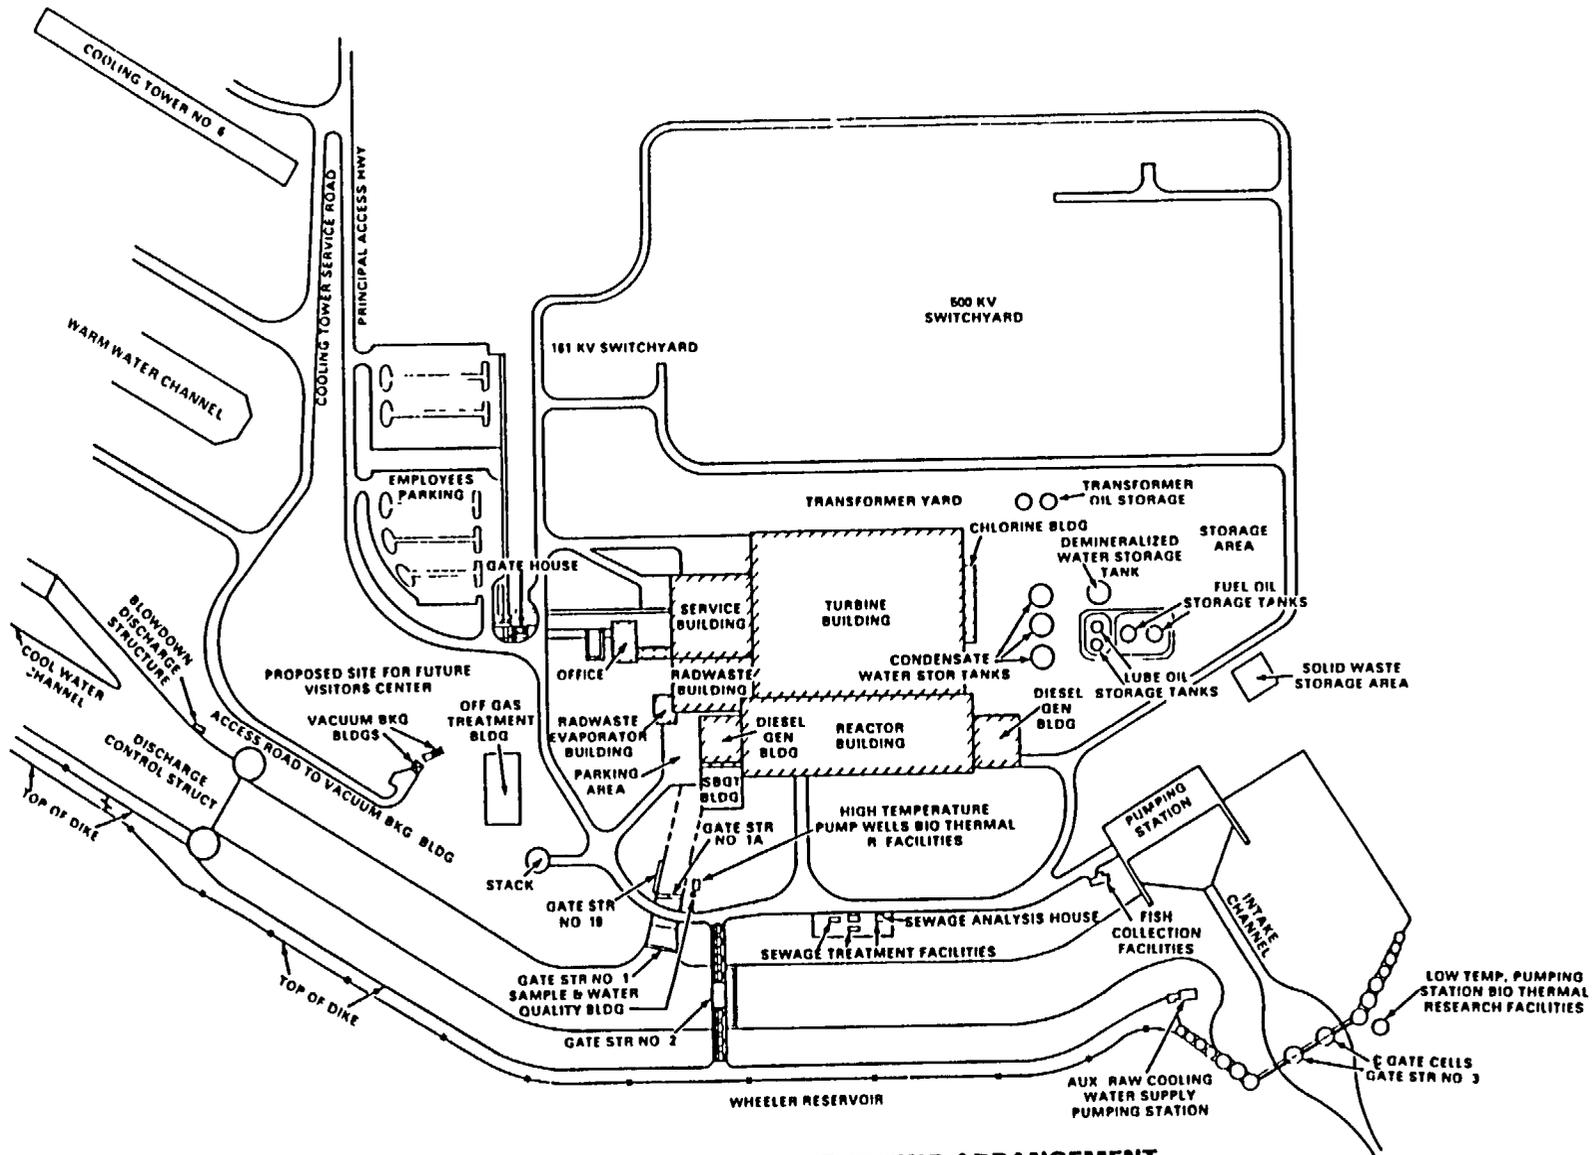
SITE PLAN AND BUILDING ARRANGEMENT
